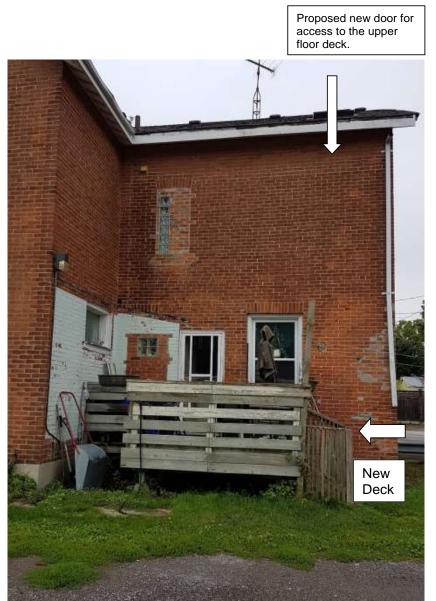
Current conditions of the rear deck. The applicant proposes a new two storey wood deck with black steel railing and a new door for the second floor deck. The white paint on the main floor exterior will also be removed.
